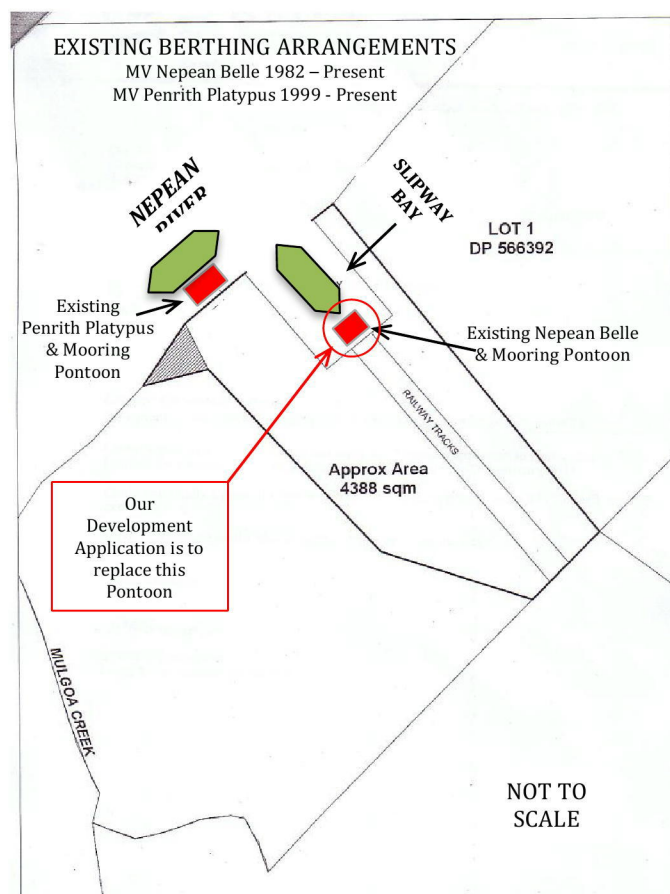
Lot 1 DP566392 - Existing Slipway Berthing Plan
